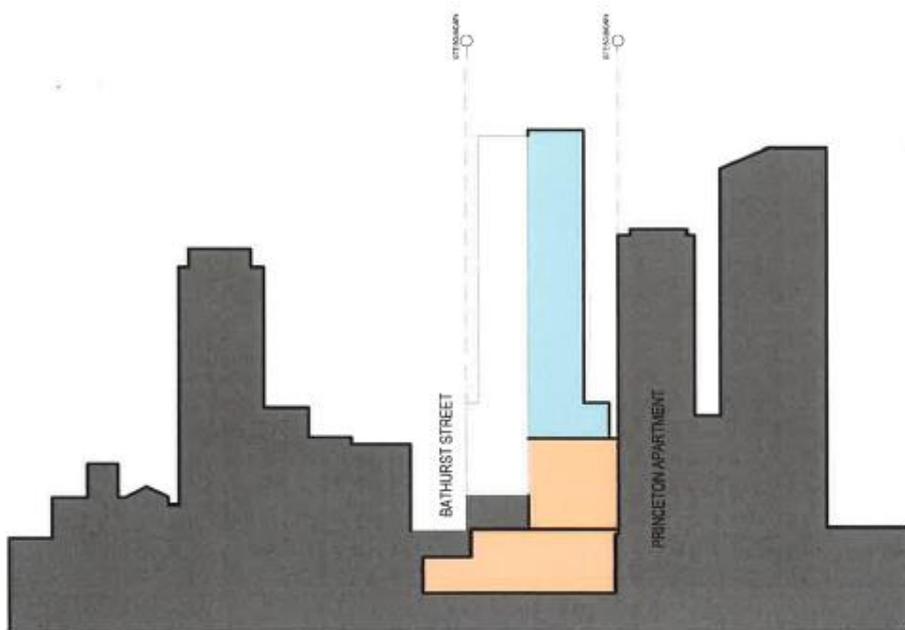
Pitt Street South Concept SSD DA – Building Section
